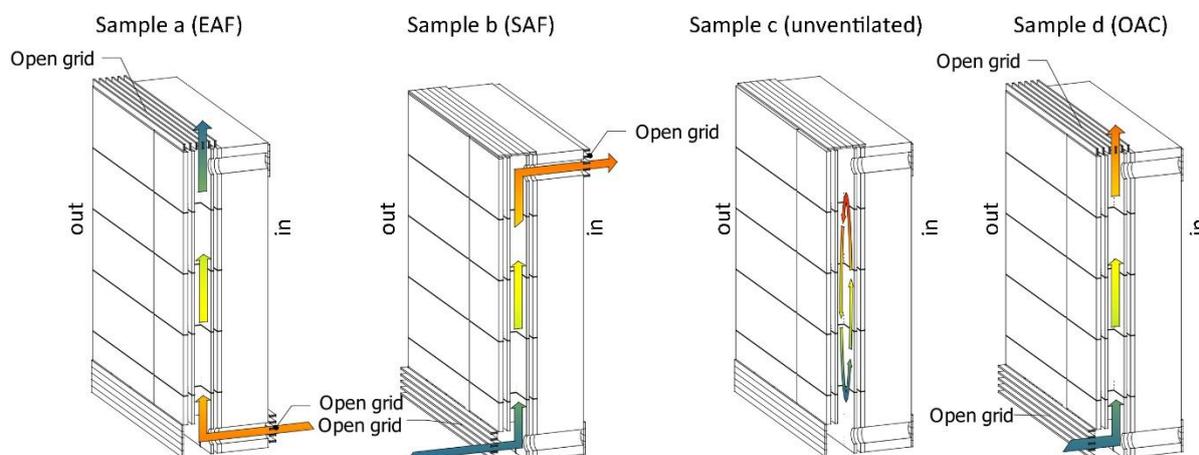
Tested façades, (a) Exhaust air façade EAF, (b) Supply air façade SAF, (c) Reference unventilated façade RUF, (d) Outdoor air curtain OAC
